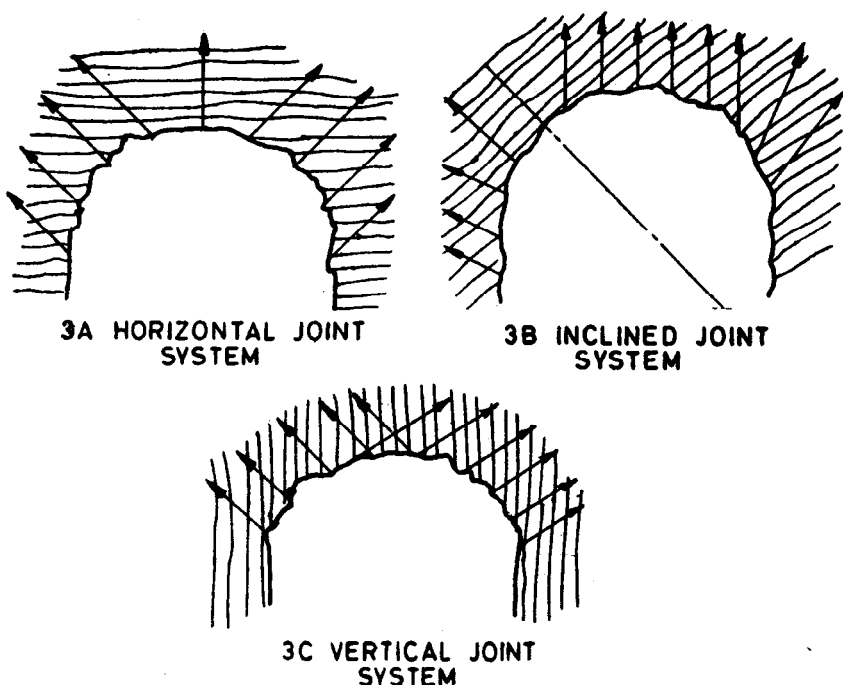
ROOF BOLTING IN STRATA RUNNING AT VARIOUS ANGLES OF DIP
